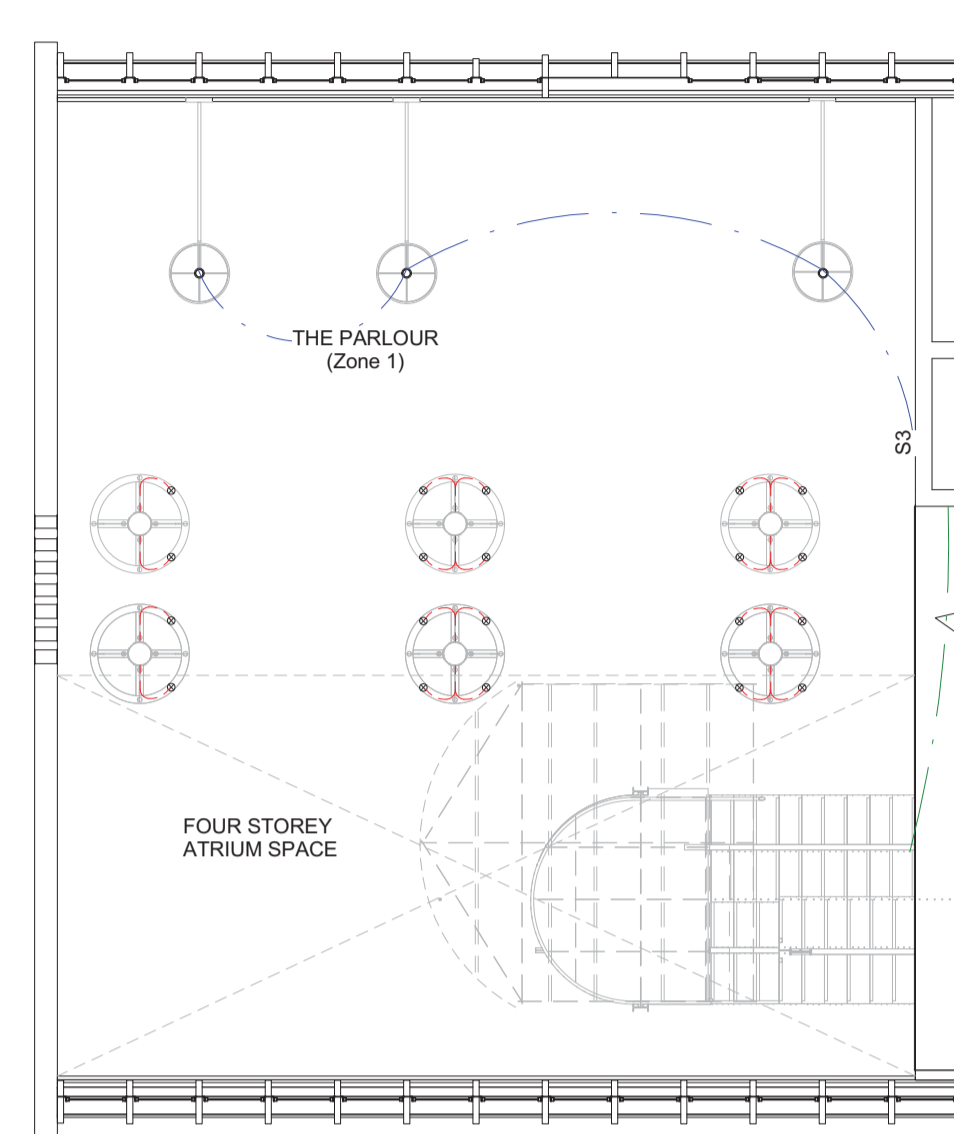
FIRST FLOOR LIGHTING PLAN
